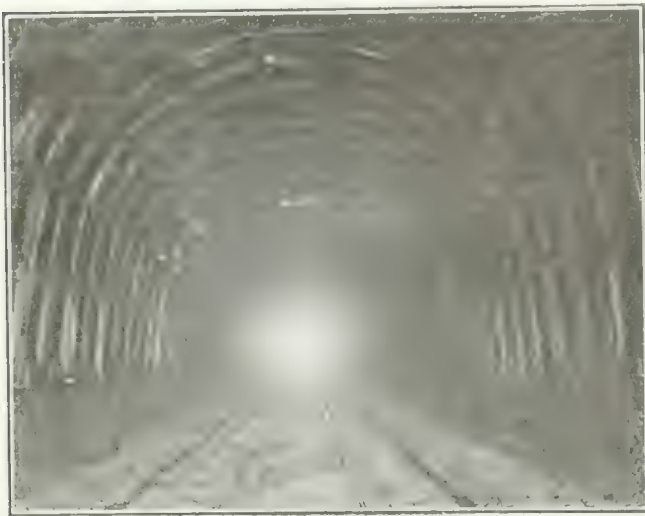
TUNNEL ARCH BRACED TO PREVENT FAILURE
